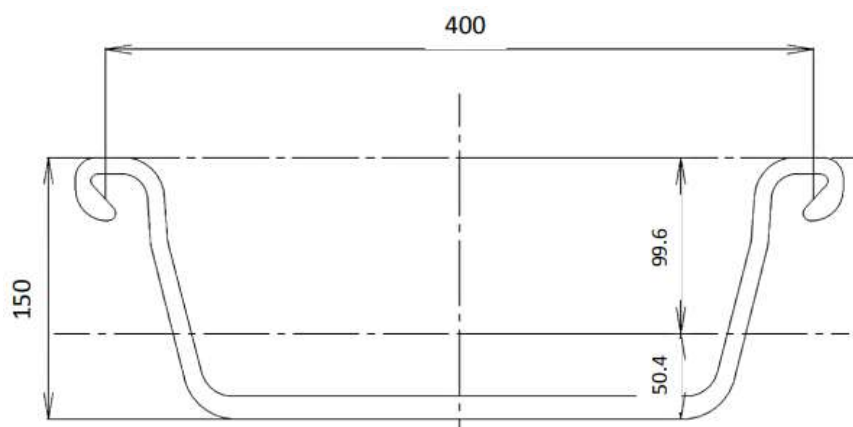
Sheet pile section (dimensions in mm) (NSSMC, 2016)
